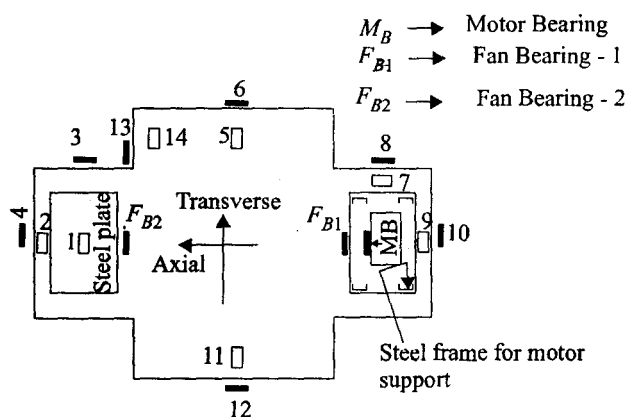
Pick up Location at Foundation Top and Sides
